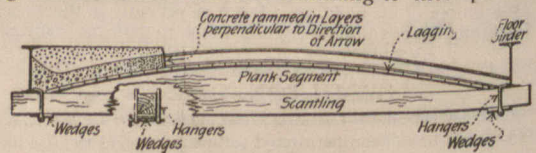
SKETCH SHOWING METHOD OF CONSTRUCTING MELAN CONCRETE AND IRON FLOORS.
